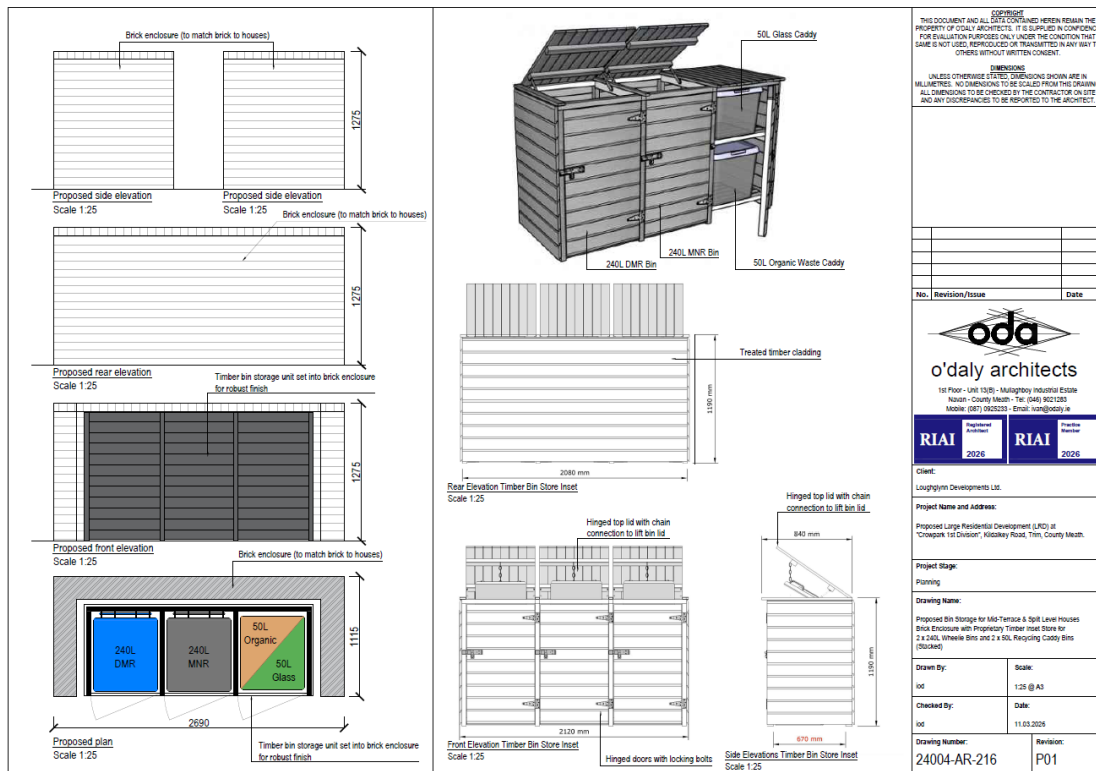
Proposed Bin Storage for Mid Terrace & Spill Level Houses.
